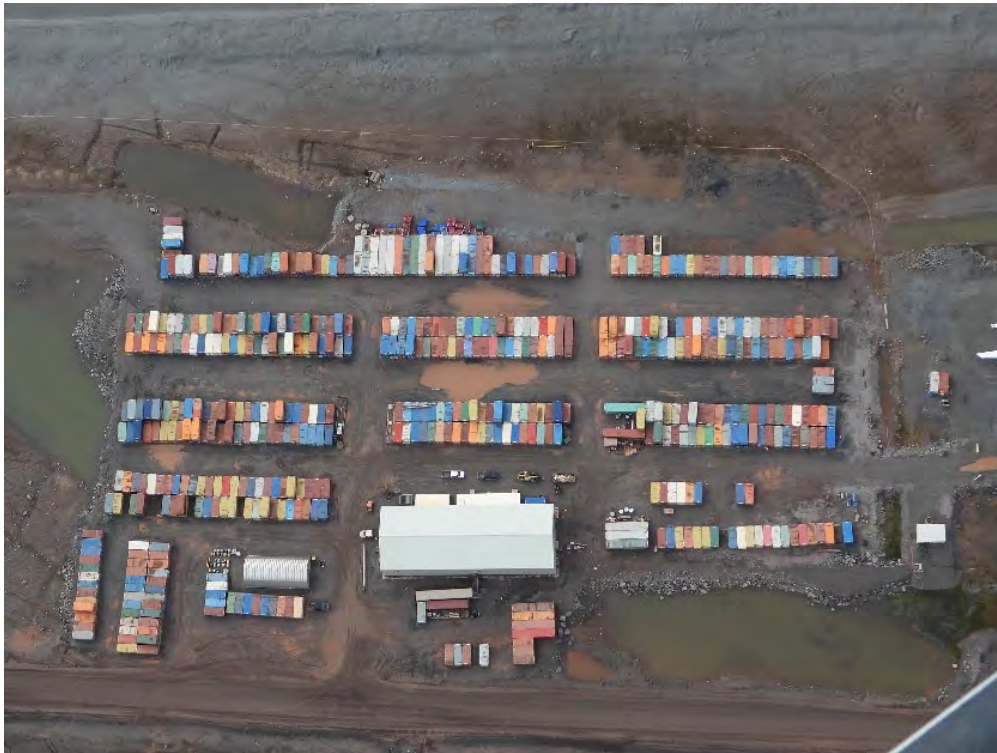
Aerial View of OHT Laydown and Laydown 2 – September 2023
